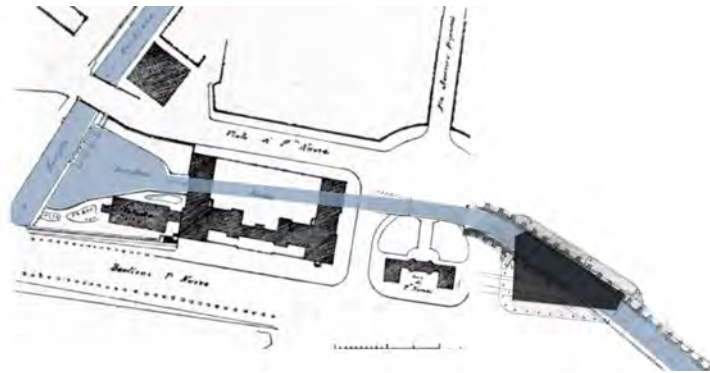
The school and the building lot directly above the concreted canal in Porta Nuova
